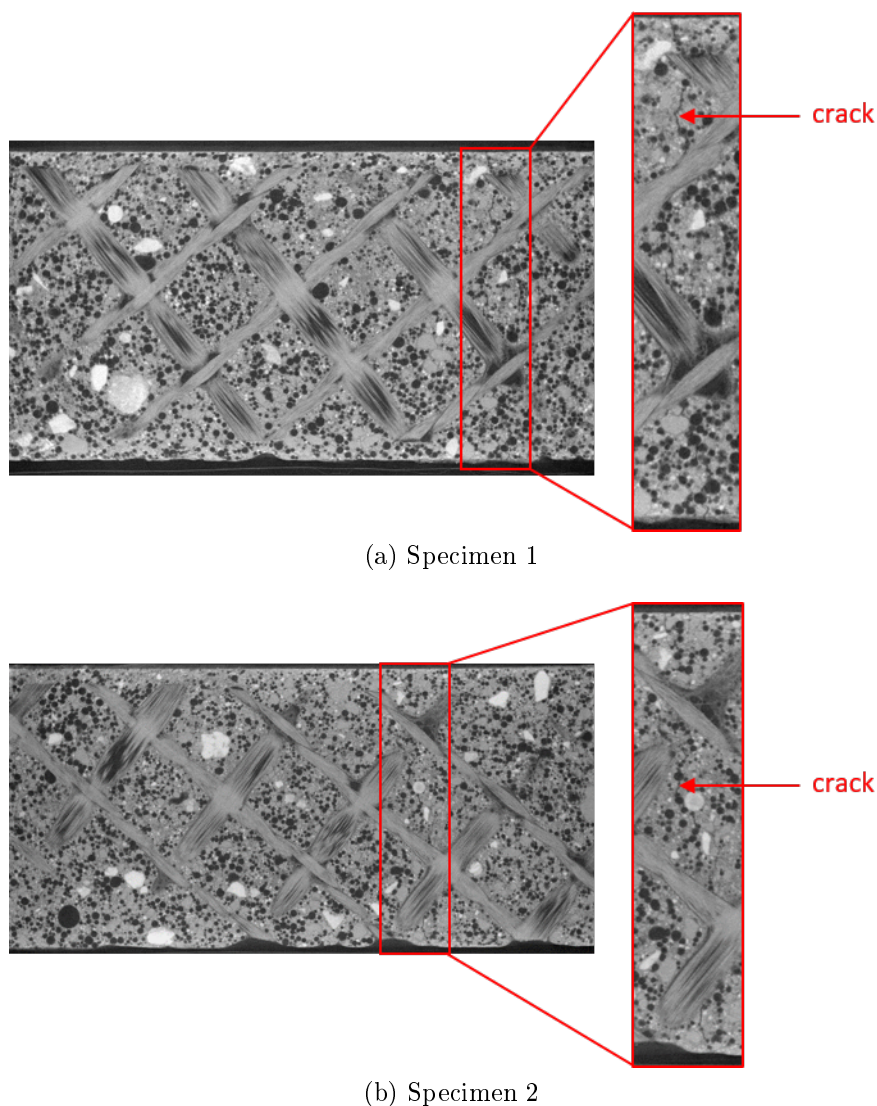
Horizontal sections inside the reconstructed volume of the cracked M1-45-2 samples: (a) specimen 1 and (b) specimen 2.
